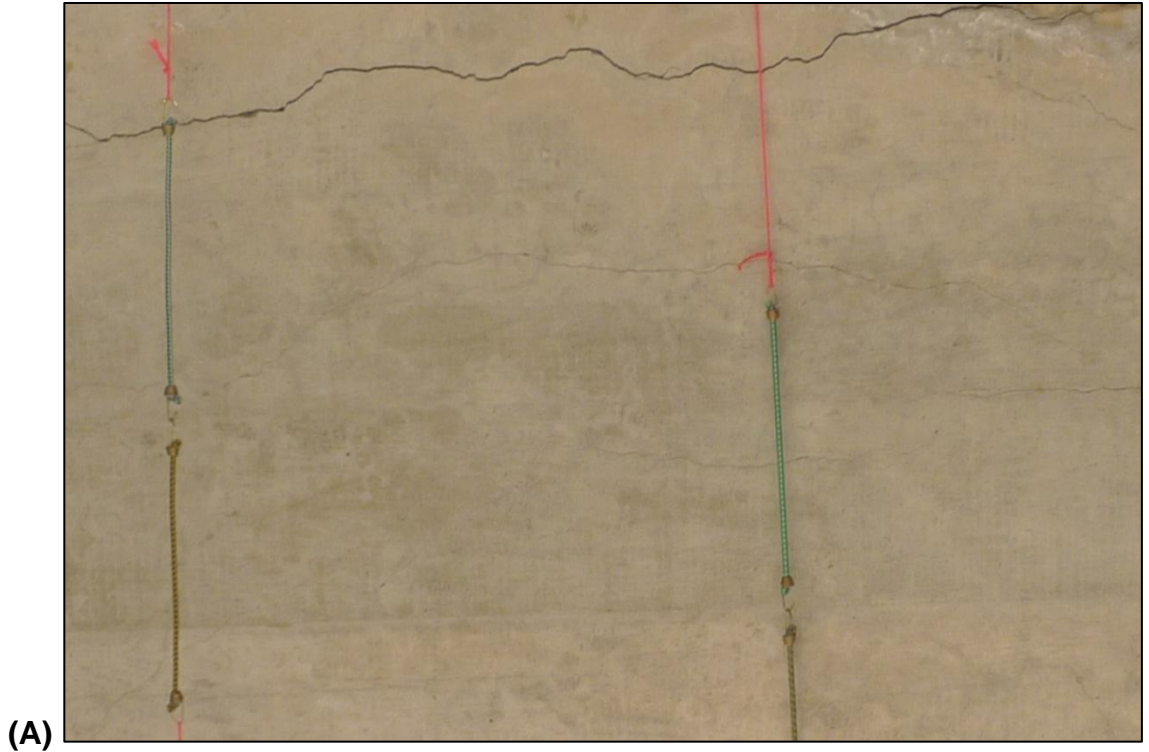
Widening and elongation of existing cracks in span 4 – south arch,
